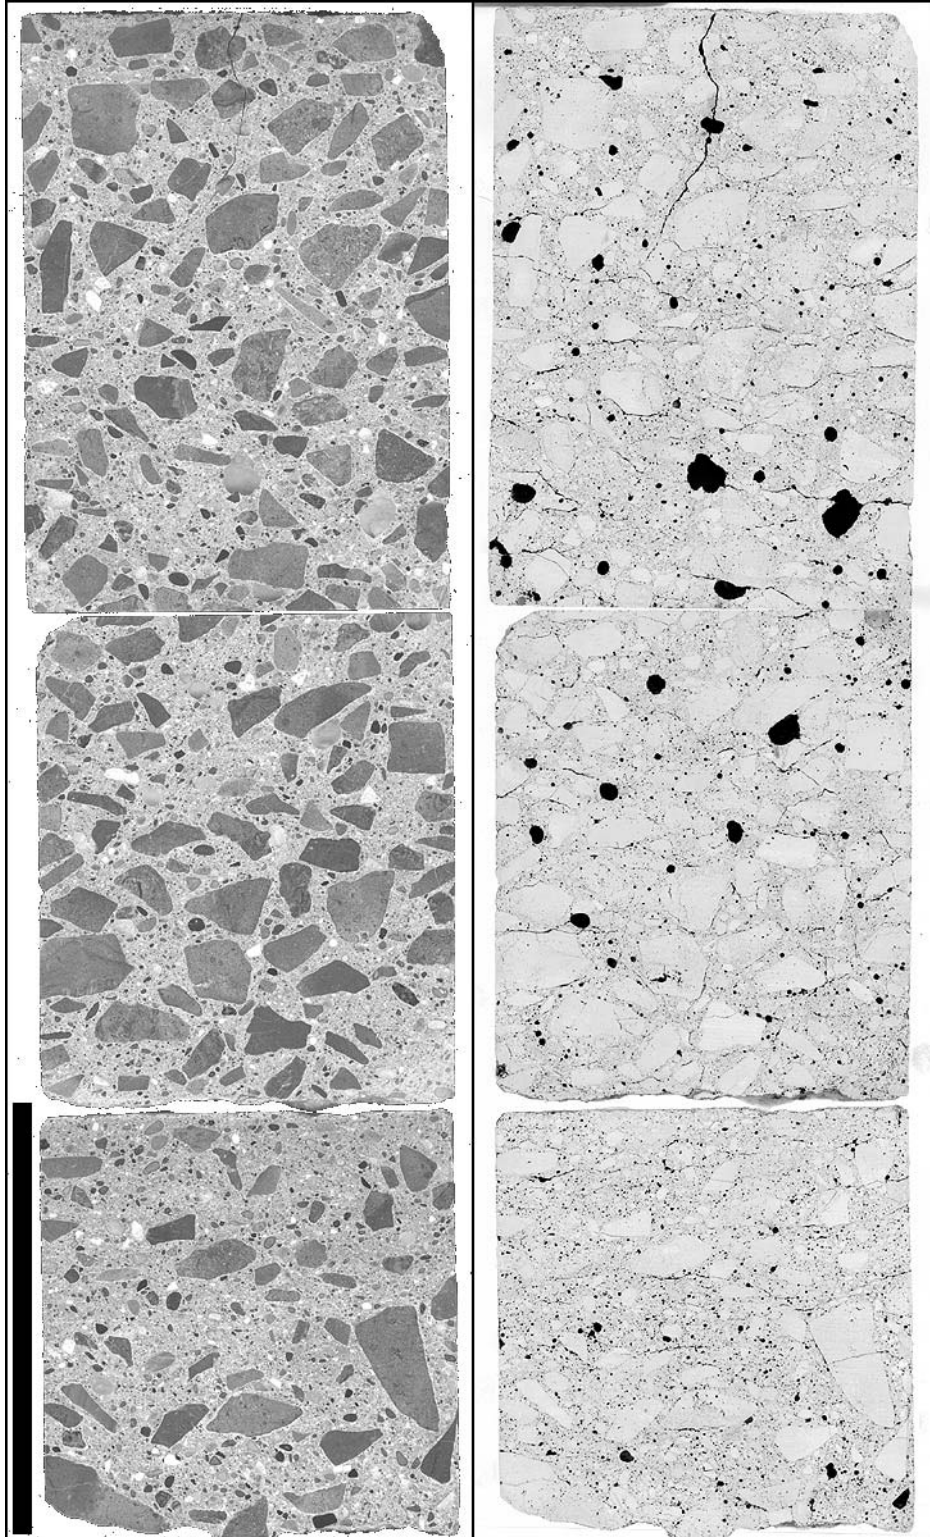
Polished slabs from core "2", left side shows slabs as-polished, right side shows slabs after treatment to enhance air voids and cracks, scale bar 10 cm.
